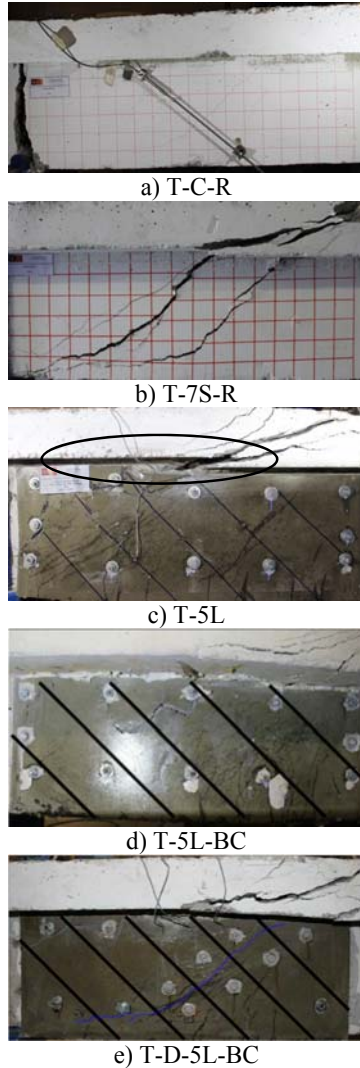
Crack pattern at failure of T cross section beams strengthened with SHCC/HCP
